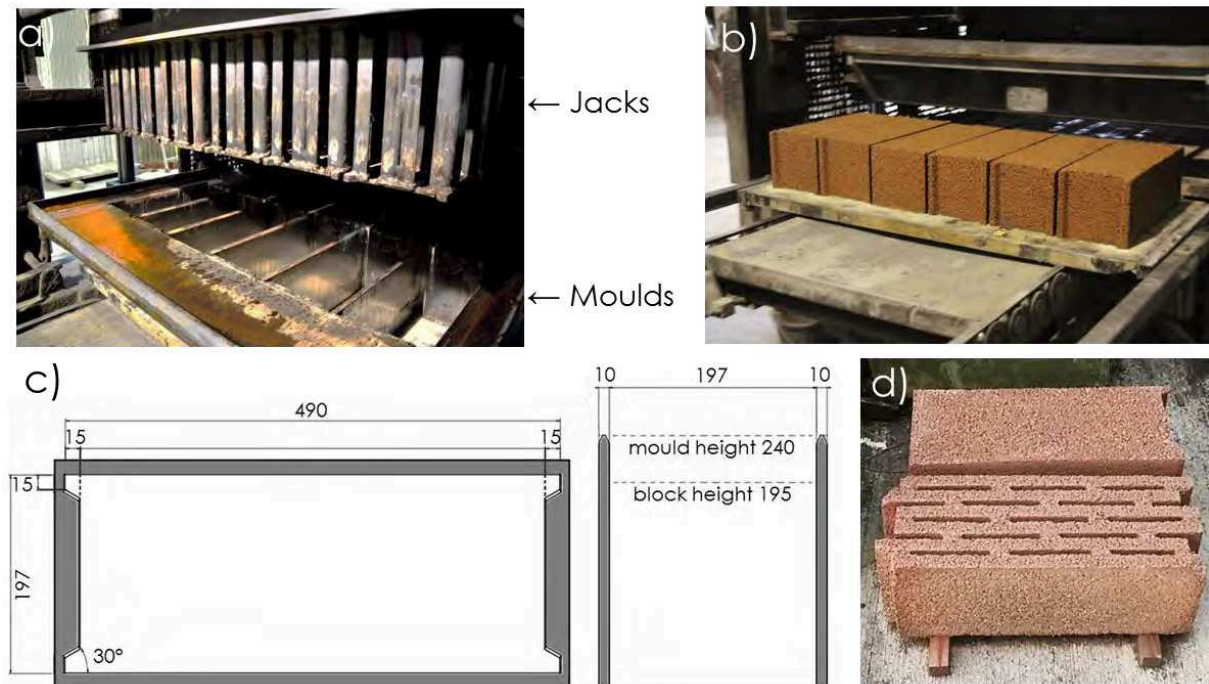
a) Manufacturing plant vibro-compaction equipment with 6 moulds; b) geopolymer concrete blocks just removed from the moulds; c) schematic representation of one mould (units are mm) and d) full and air blade geopolymer blocks. SEAC “Guiraud frères” precast plant, 09120 Varilhes, France.
